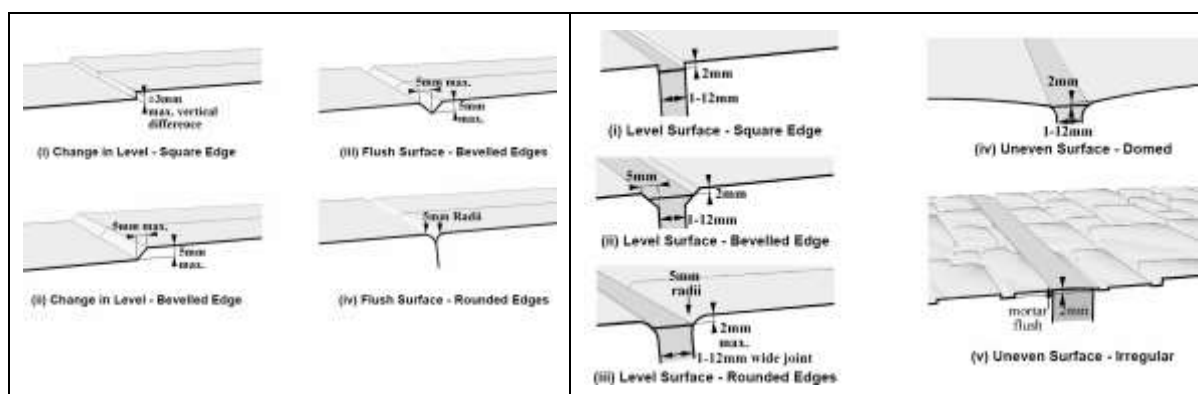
diagrams indicating the acceptable tolerances between pavement finishes
